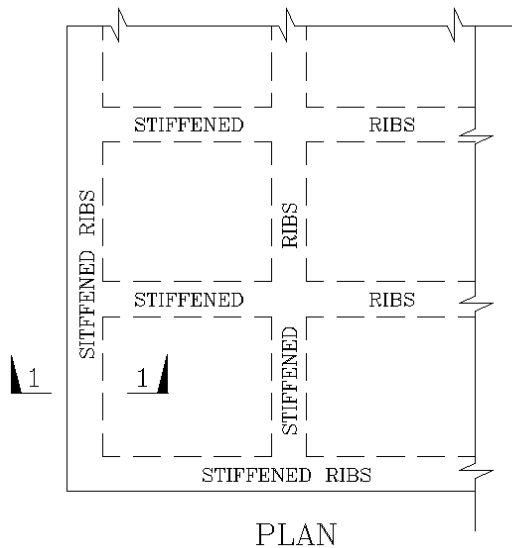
A Typical Detail of Stiffened Slab Waffle Foundation
